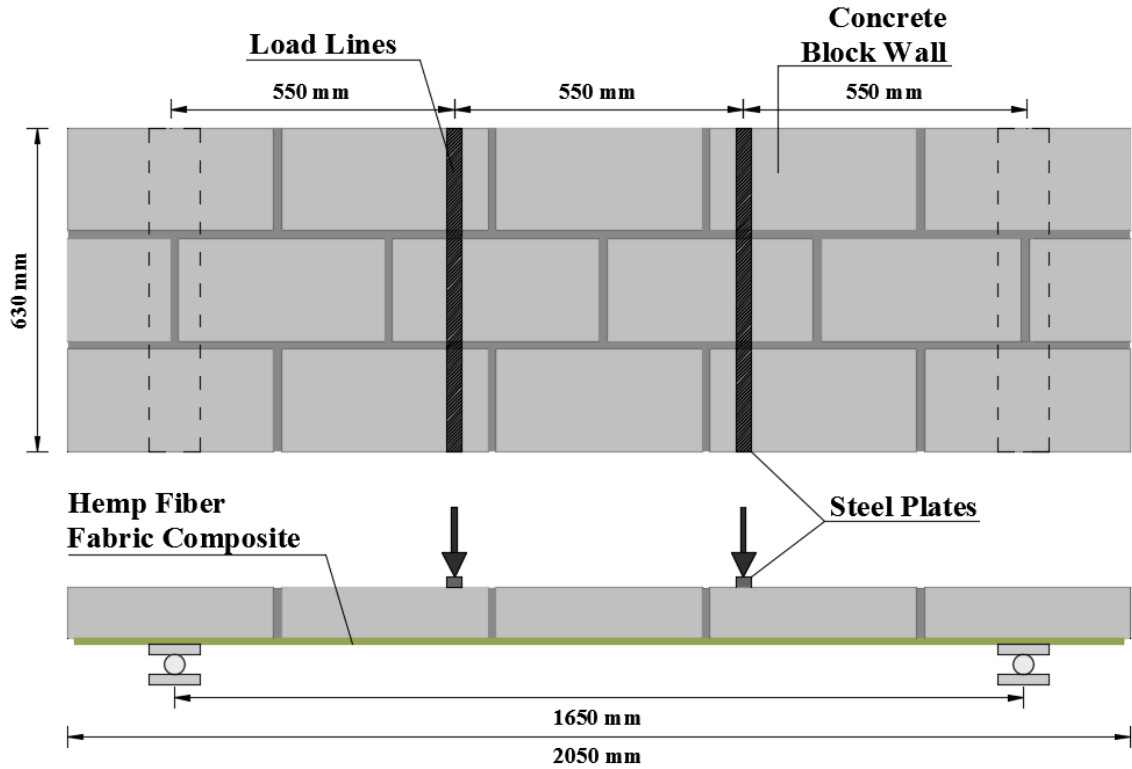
Test Setup and Dimensions of the Wall Specimens.
